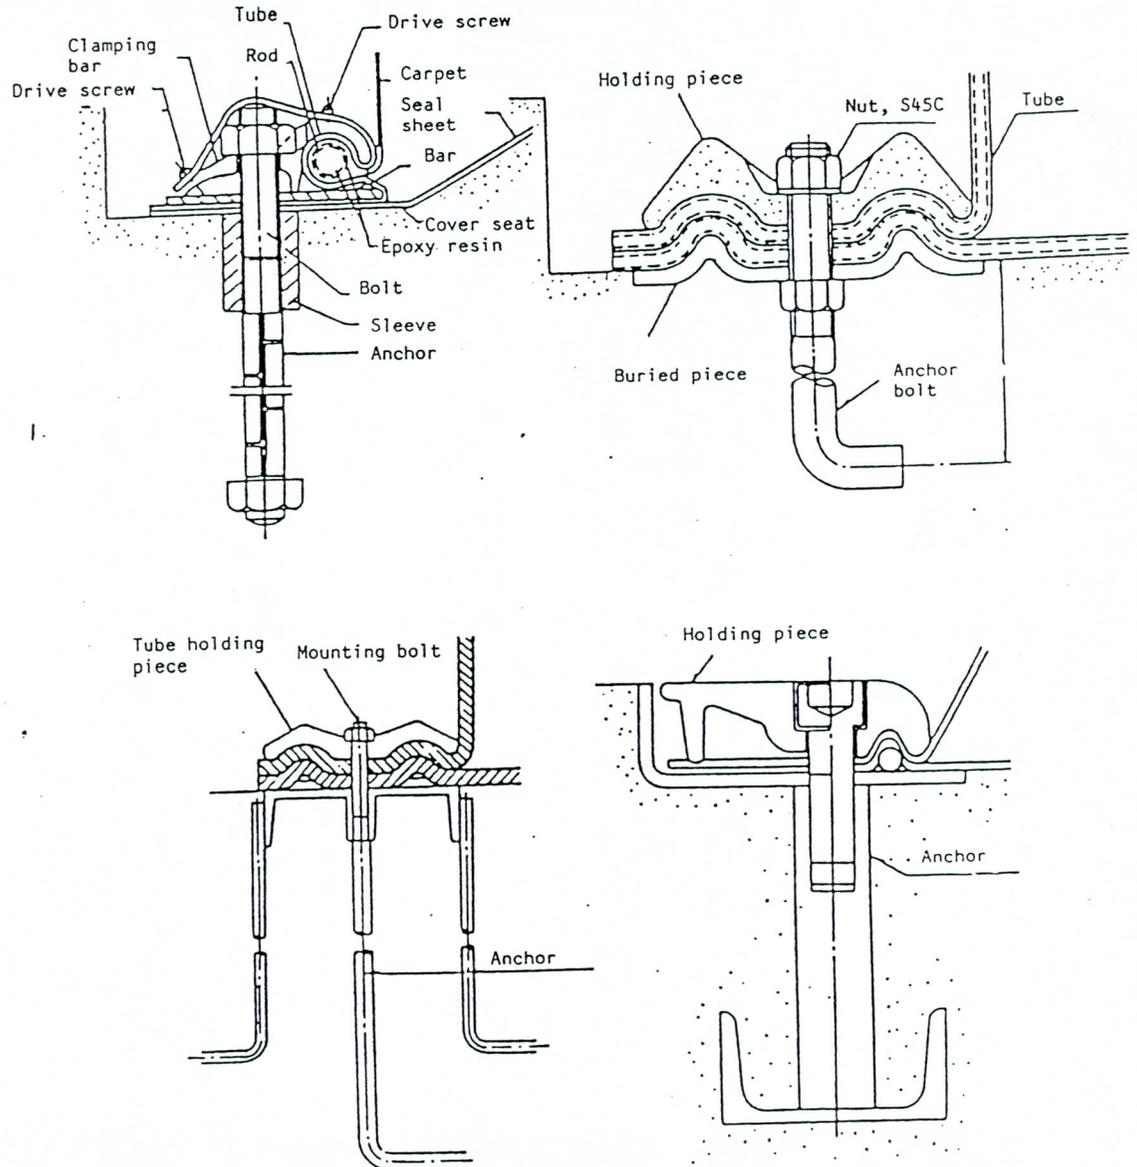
Examples of tube affixing fittings and fixing bolts
